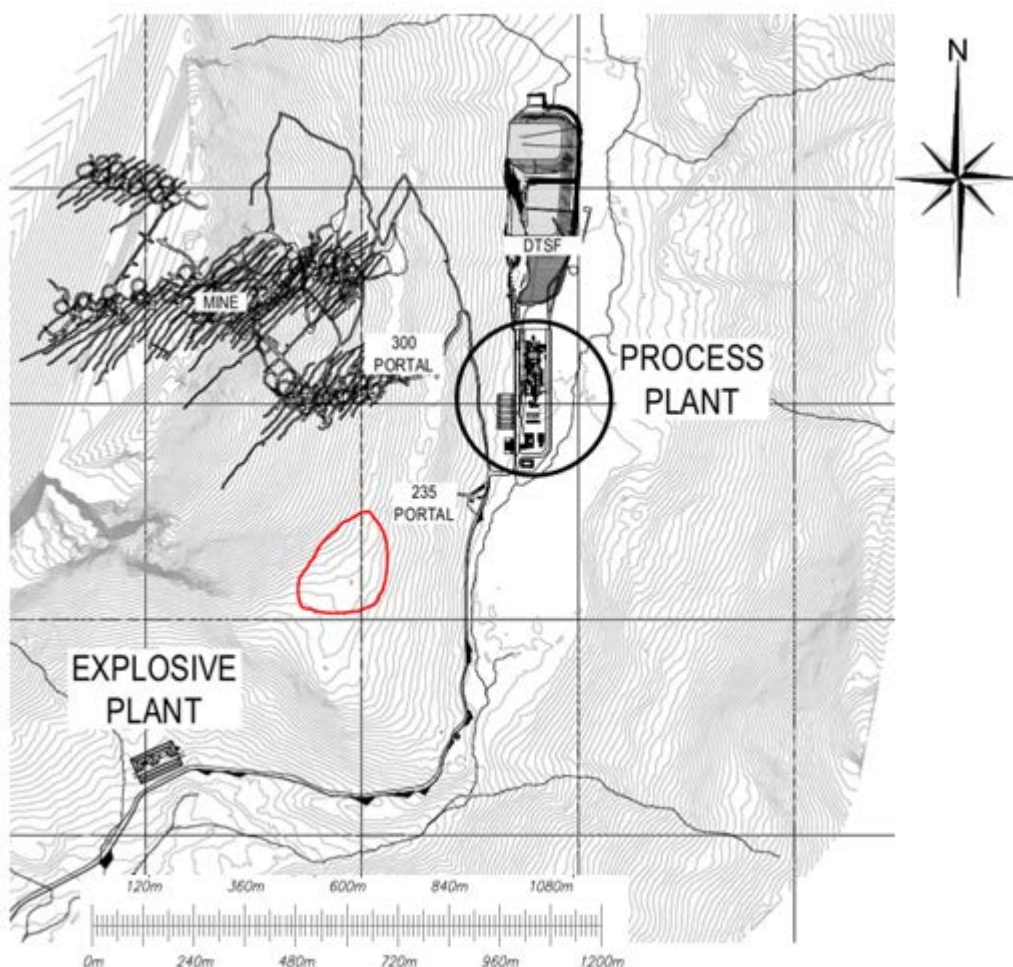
Plan view of indicative area of potential waste rock stockpiling (area encircled by red line)
